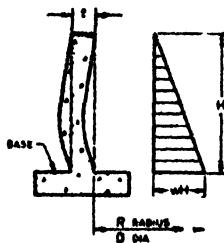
WALL WITH FIXED BASE AND FREE TOP SUBJECTED TO TRIANGULAR LOAD
